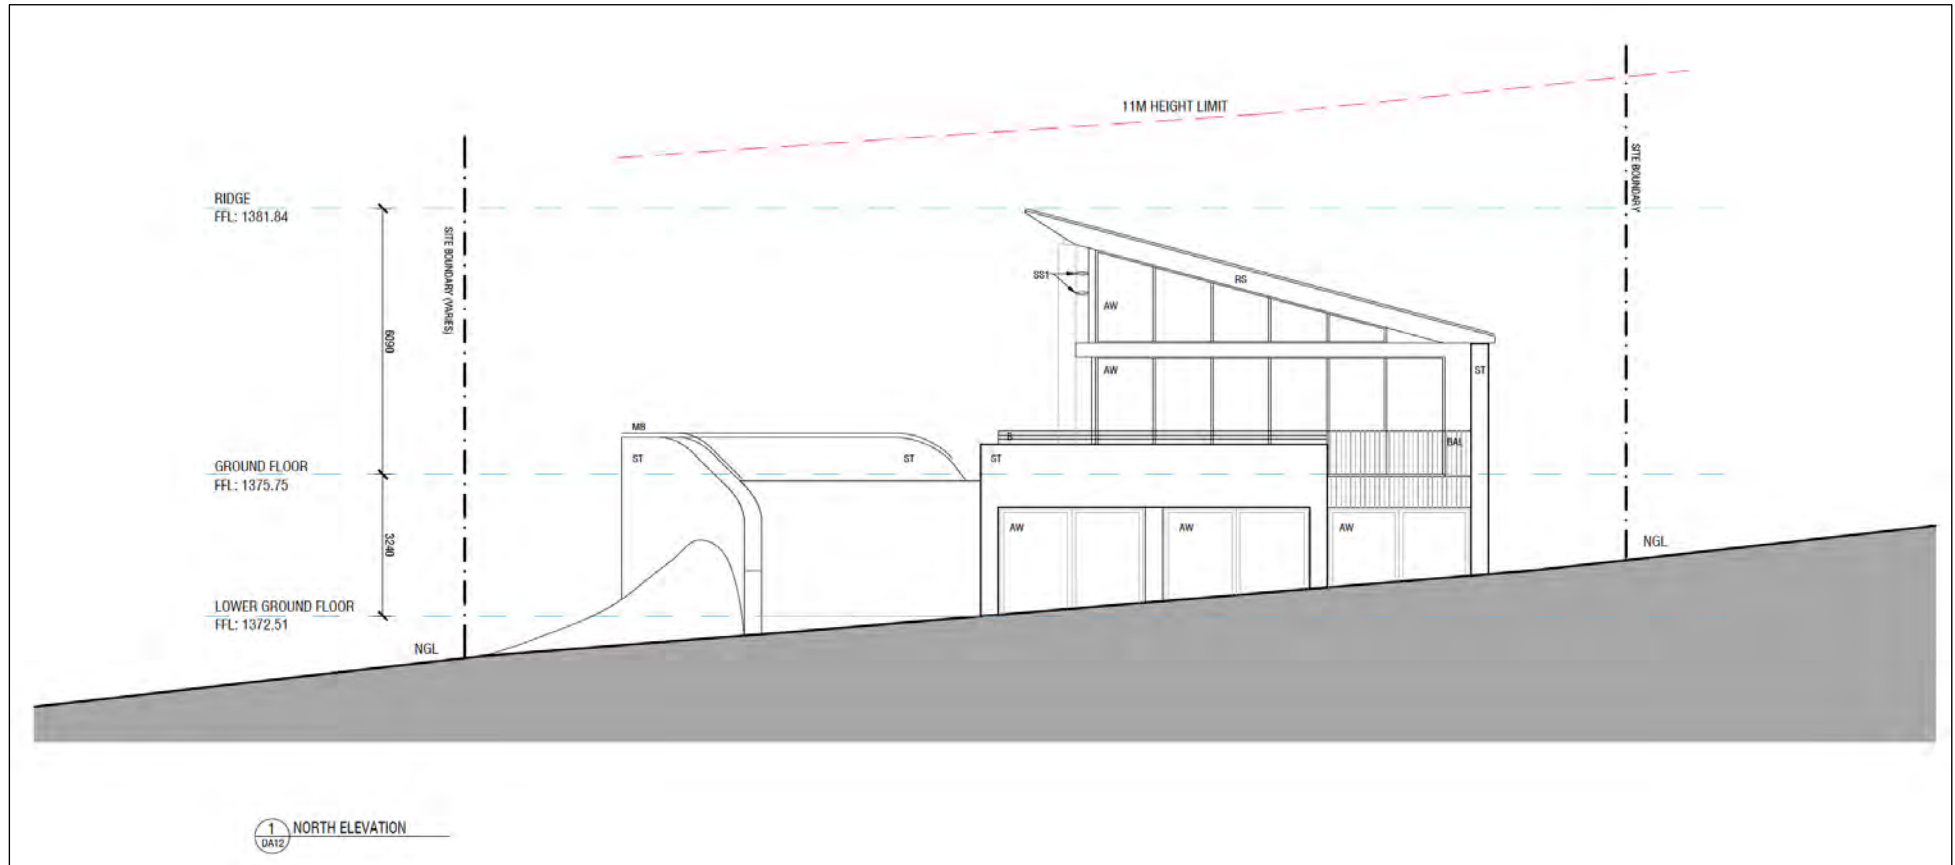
Proposed lodge northern elevation (Collins Pennington Architects, 2021)
